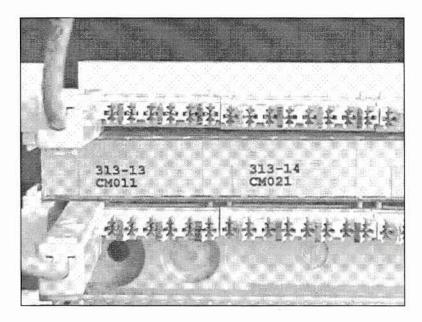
Labelled 110-Type Wiring Block, with 1-pair Jumper Cord Installed
